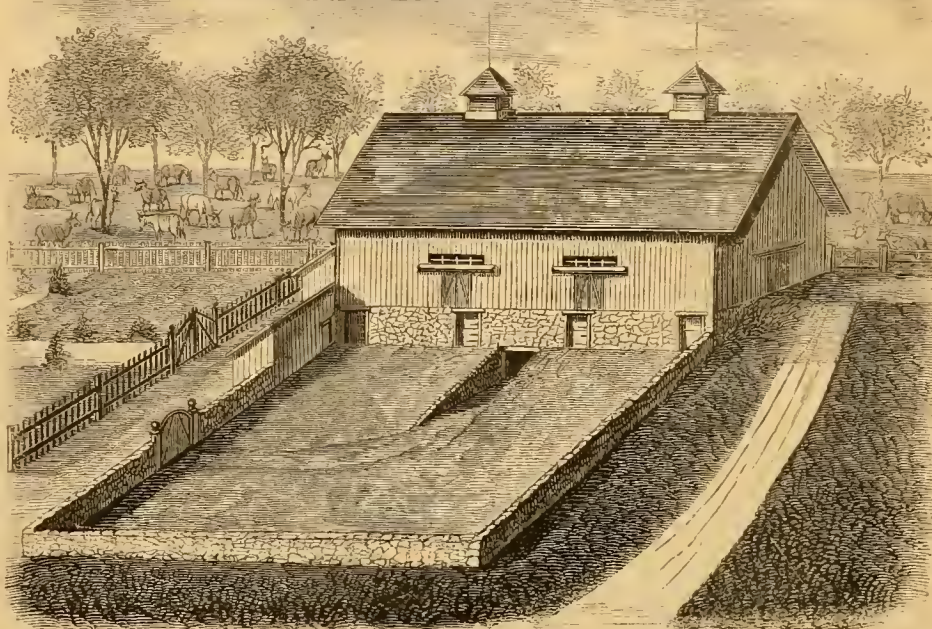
A NEW YORK DAIRY BARN.—(See page 140.)
